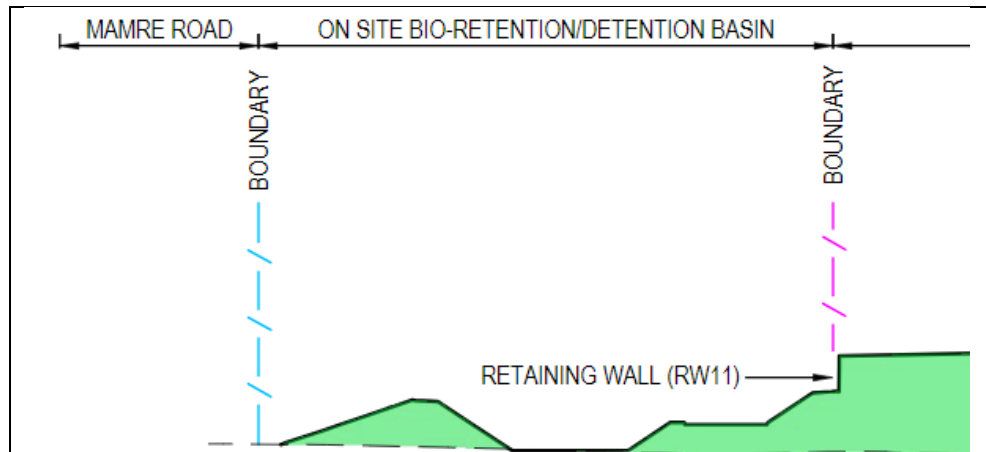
Excerpt from Civil plans indicating location of retaining wall on boundary impacting proposed large canopy tree planting.
